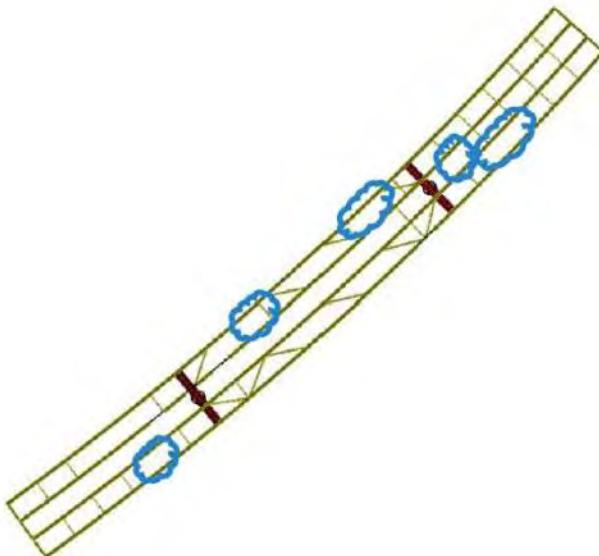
Framing plan of remaining members after four total elastic hinges at 0.03 x HL-93 (Deck not shown for clarity)
